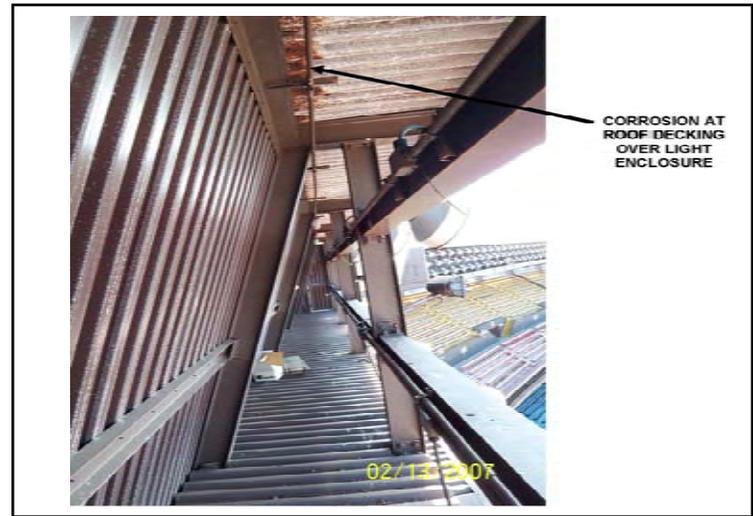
Roof metal deck over roof framing supports at NE movable stand.
